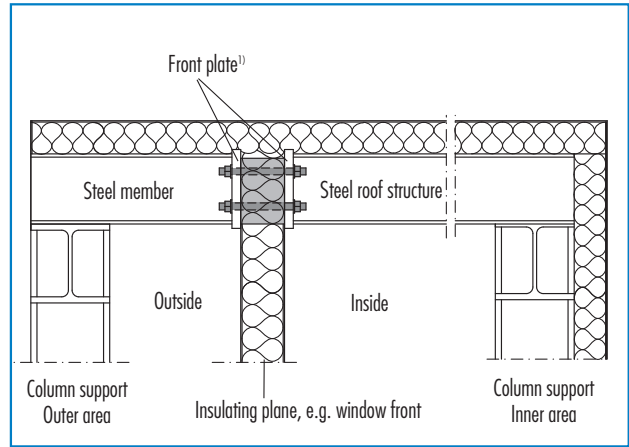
Schöck Isokorb® type KST for separation within the structural system
